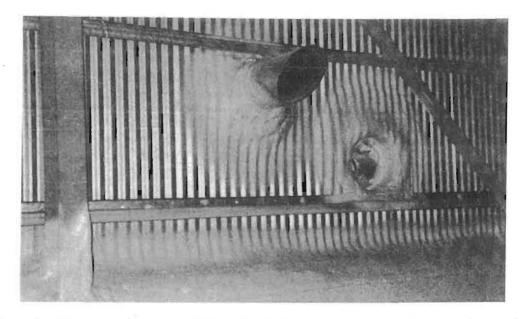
Foam application along an inside wall ledge and around the fan and pressure release duct fitted into a gable and wall.
